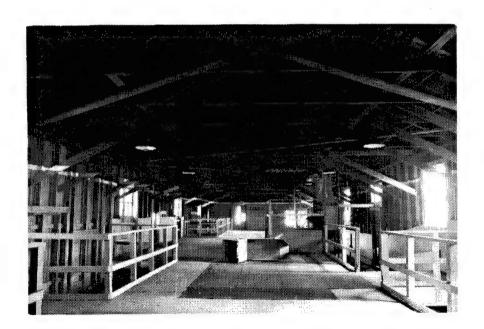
Building 262-2: Interior view of the Powder Transfer House.
